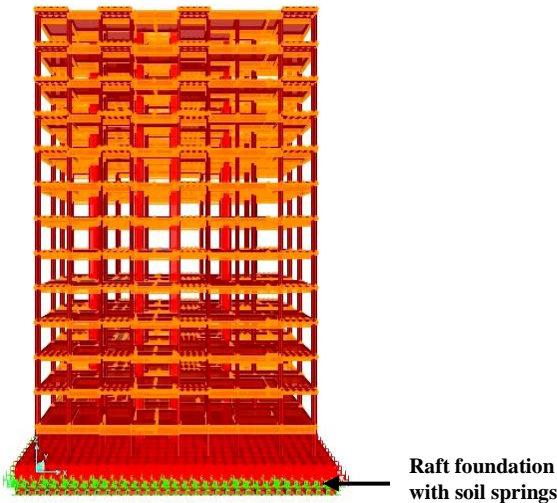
3-Dimensional Finite element model of the building with raft foundation and applied soil springs
